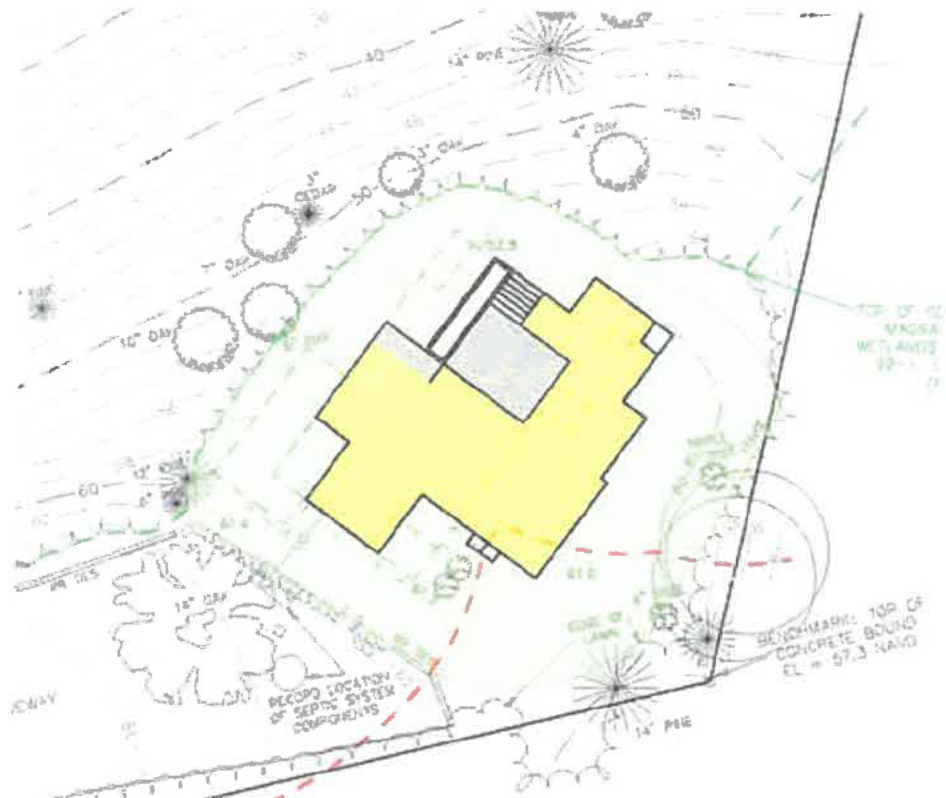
Alternative 1 - Reconstruct a new single-story home on the existing foundation
